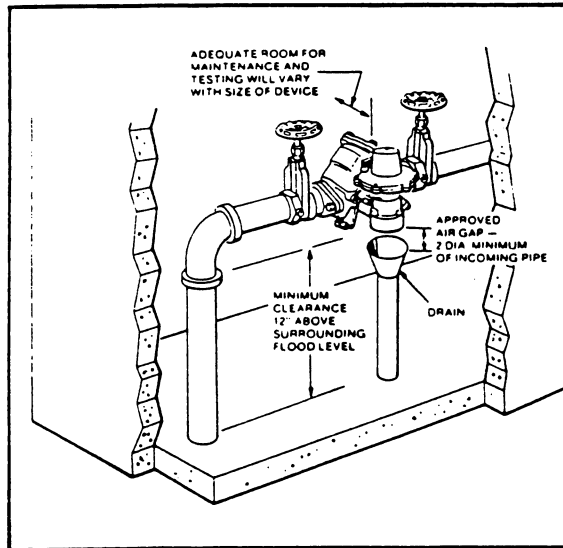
TYPICAL INSTALLATION IN BUILDING
